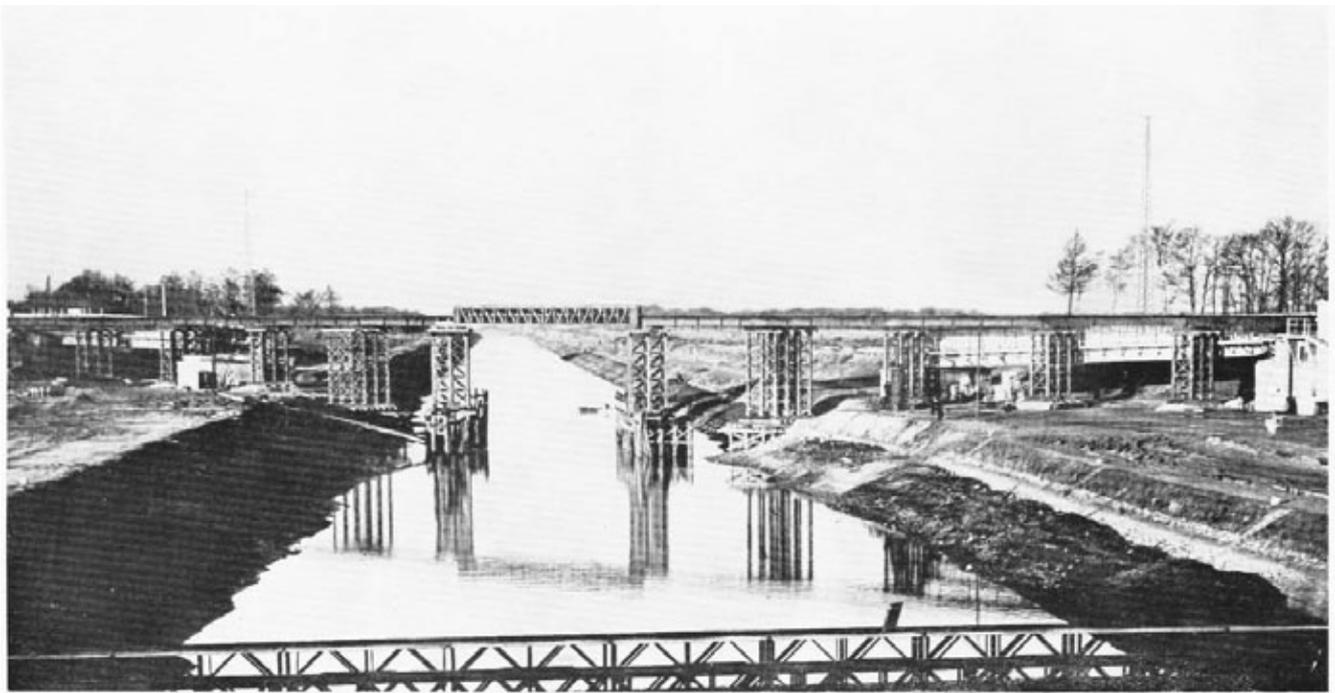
Bridge over the Albert Canal at Herenthals. View after reconstruction, with U.C.P.B. Through Span, 40 ft. Sectional Bridge and Standard Trestling.
